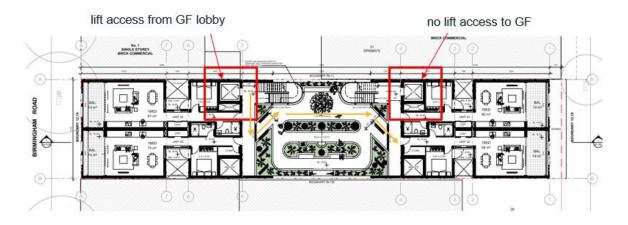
First floor plan, showing the route from the lift in the western wing, via the courtyard to the eastern wing
